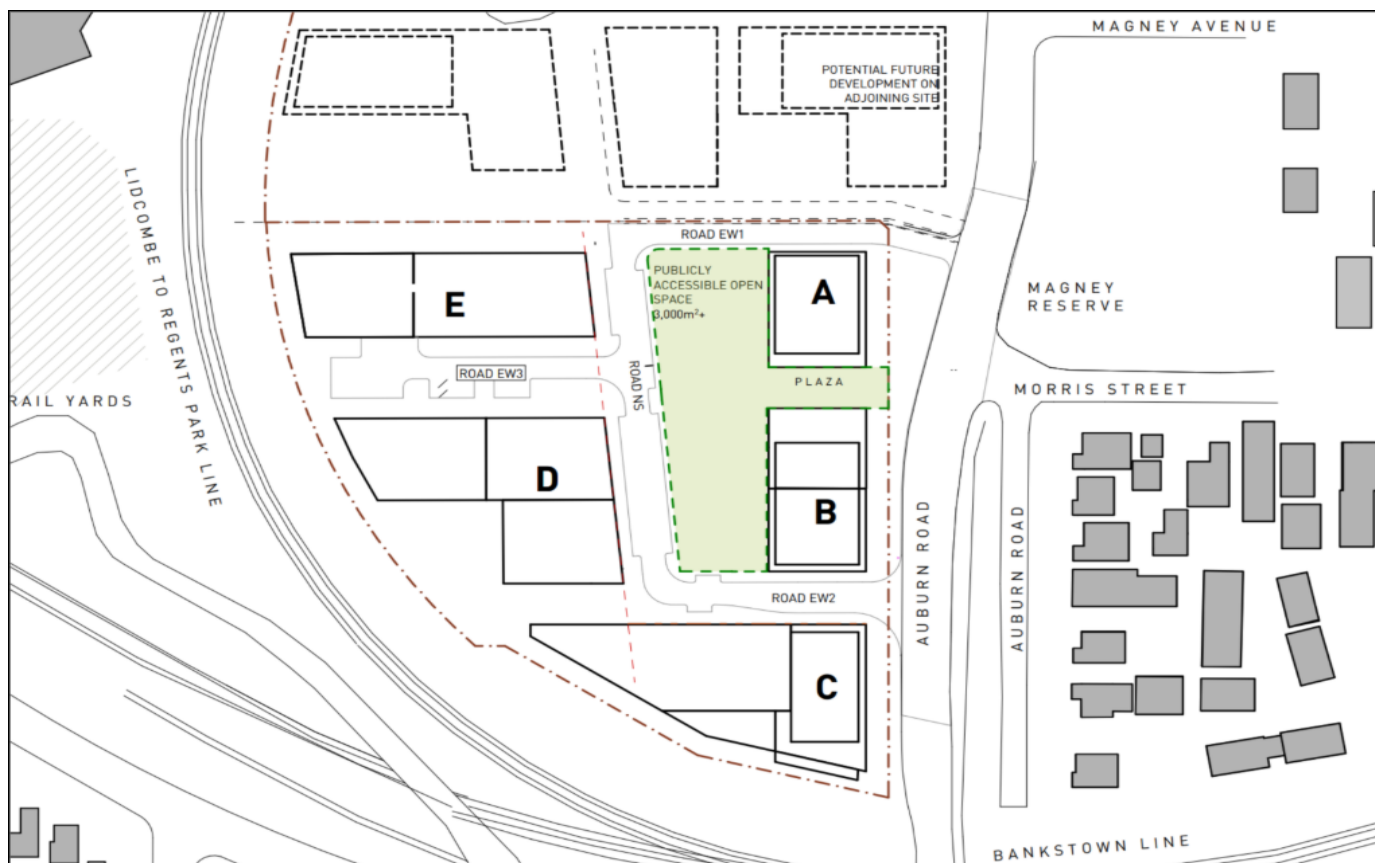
| Approved Concept Site Plan (Source: Smith & Tzannes, 2025)
